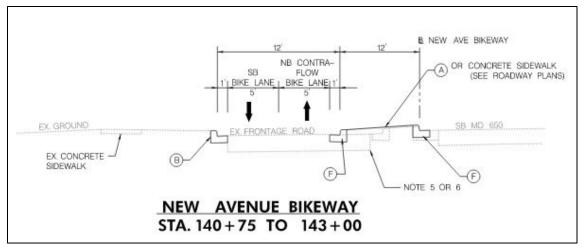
Separated Bike Lanes between Holton Lane and Kingwood Drive – Proposed Cross Section
